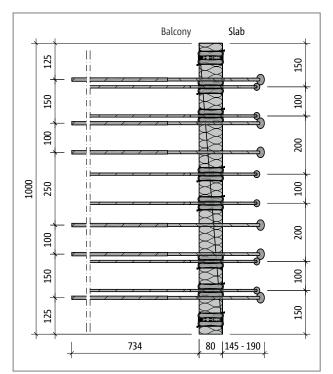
Schöck Isokorb® T type K-O-M2: Product layout
